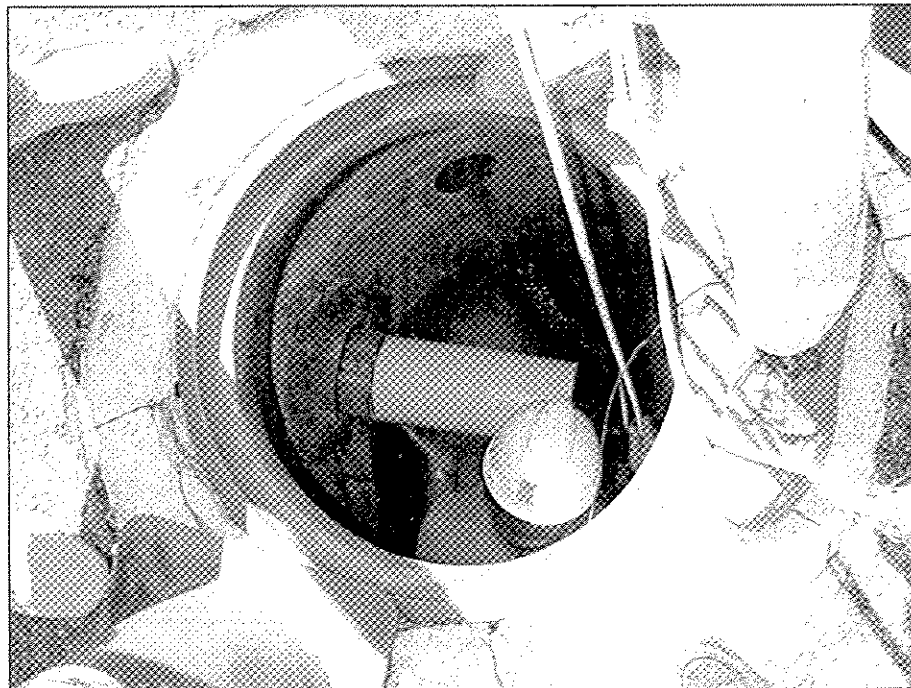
Cured-in-place pipe liner entering the receiving manhole.
